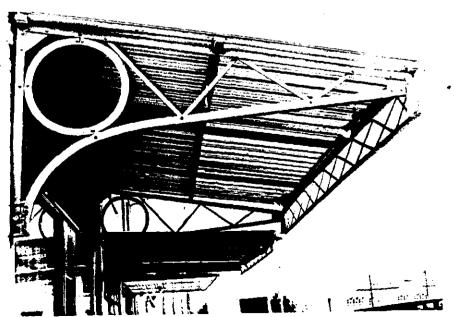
Edwardian Cantilever Brackets, 144 Stawell St.
